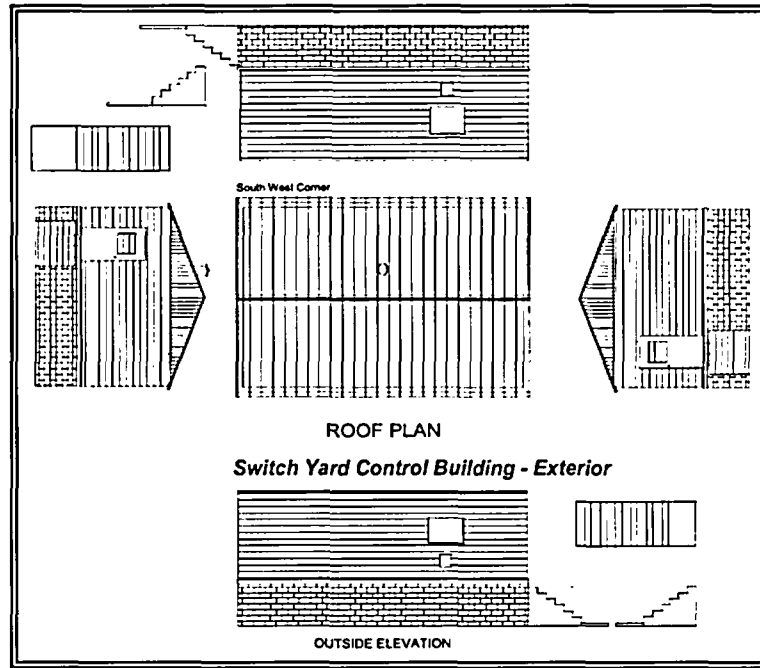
, Exterior of PENELEC Switch Yard Control Building.
